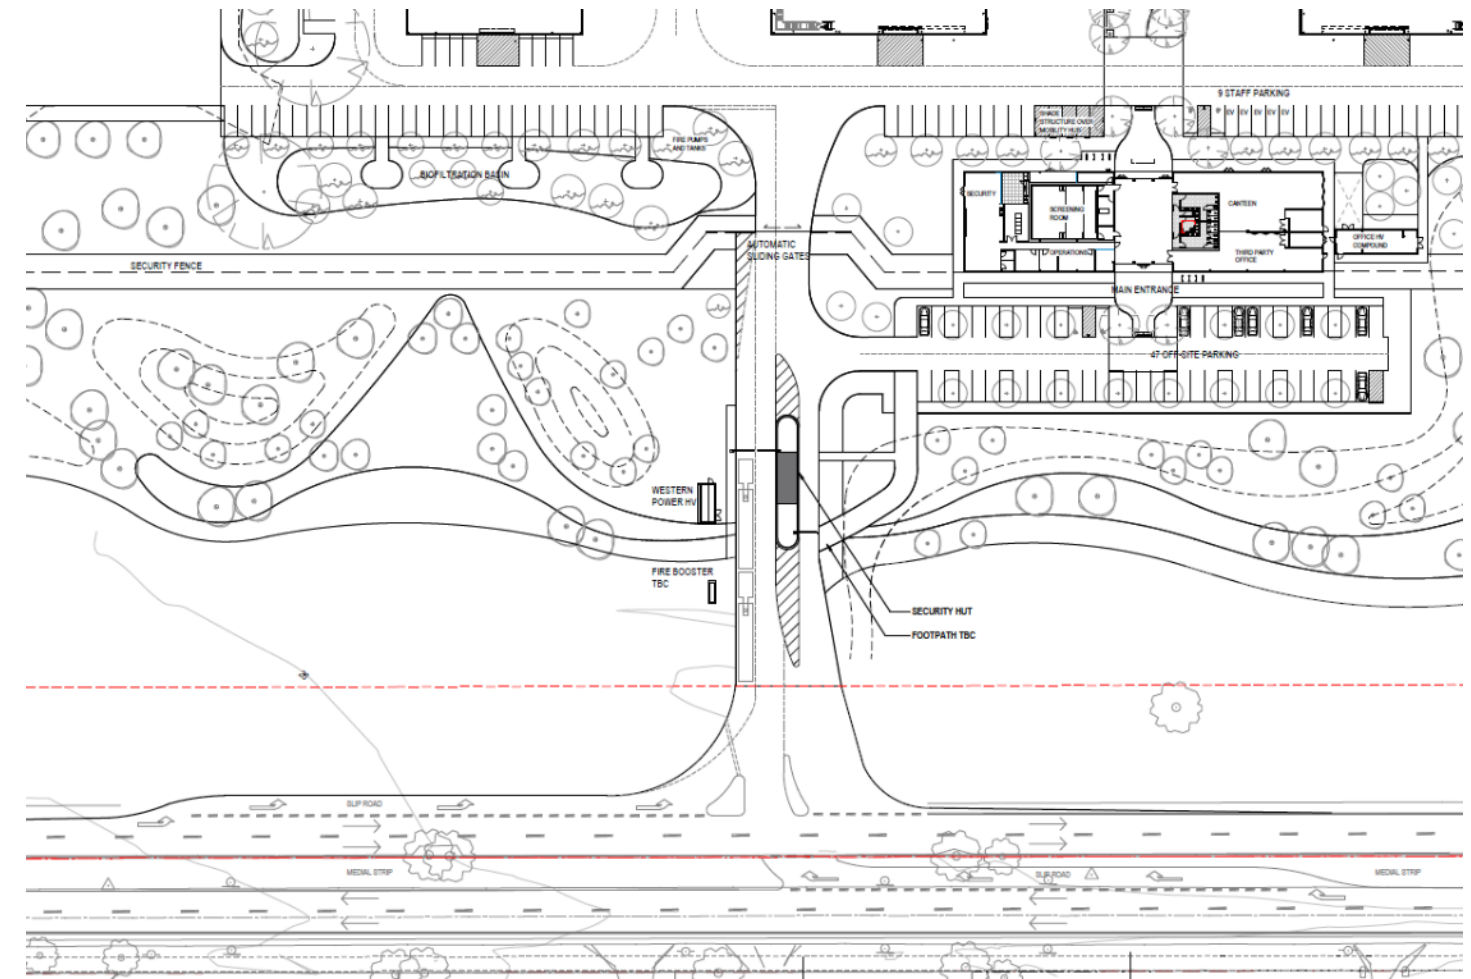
Proposed ultimate site access with combined Malaga Site entry and exit road layout and future duplication of Marshall Road (source: Hassell, March 2023)
